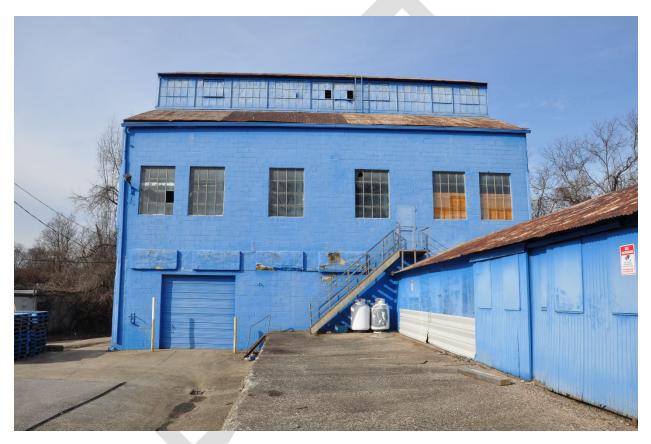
Southeast elevation of the main block of the Magnus Metal Company Building, and partial view of the southwest elevation of the addition, looking west-northwest.
